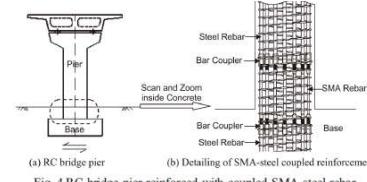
RC bridge pier reinforced with coupled SMA-steel rebar
